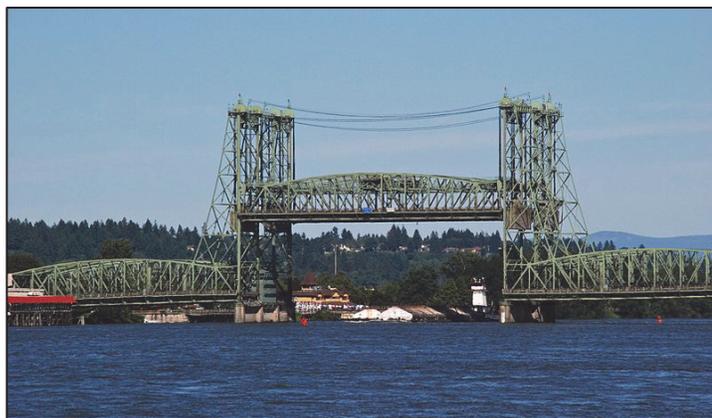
WSDOT Vertical Lift Bridge at Vancouver WA
